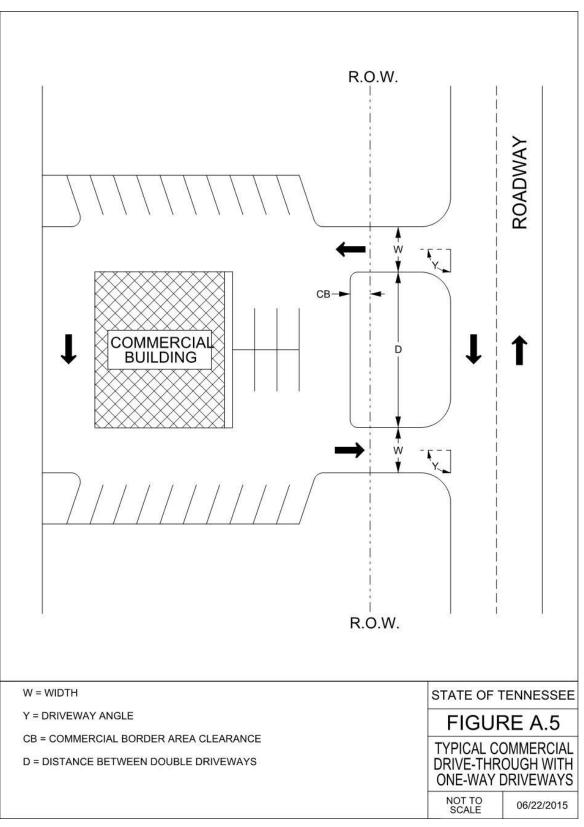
Typical Commercial Drive-Through with One-Way Driveways
